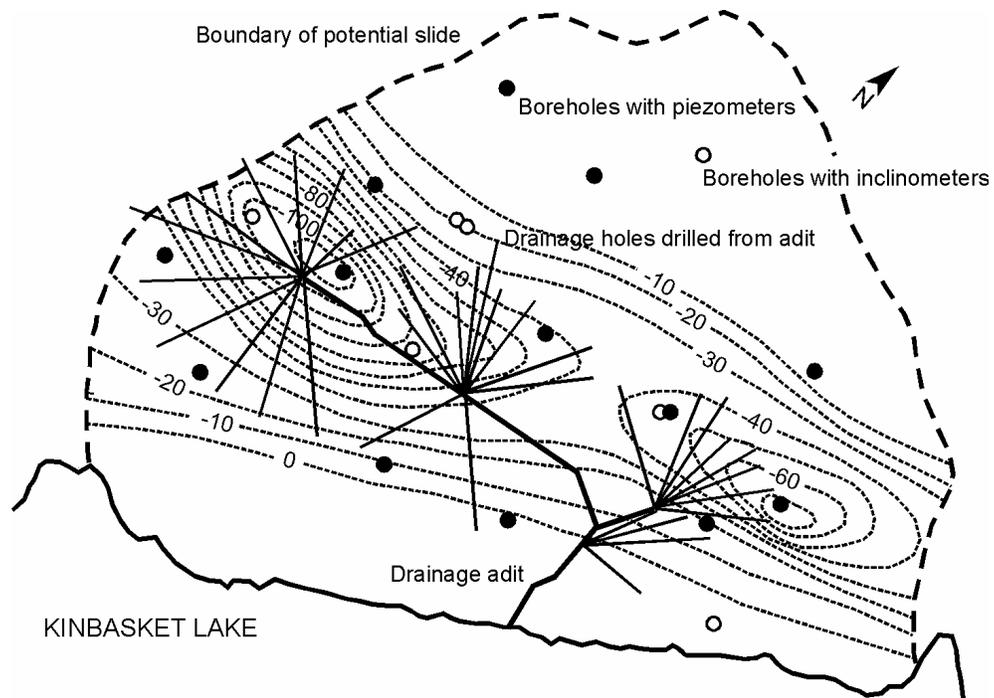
Extent of potential slide with layout of drainage gallery and drainholes drilled from underground. Contours indicate the drawdown of the groundwater levels achieved by the drainage programme.
